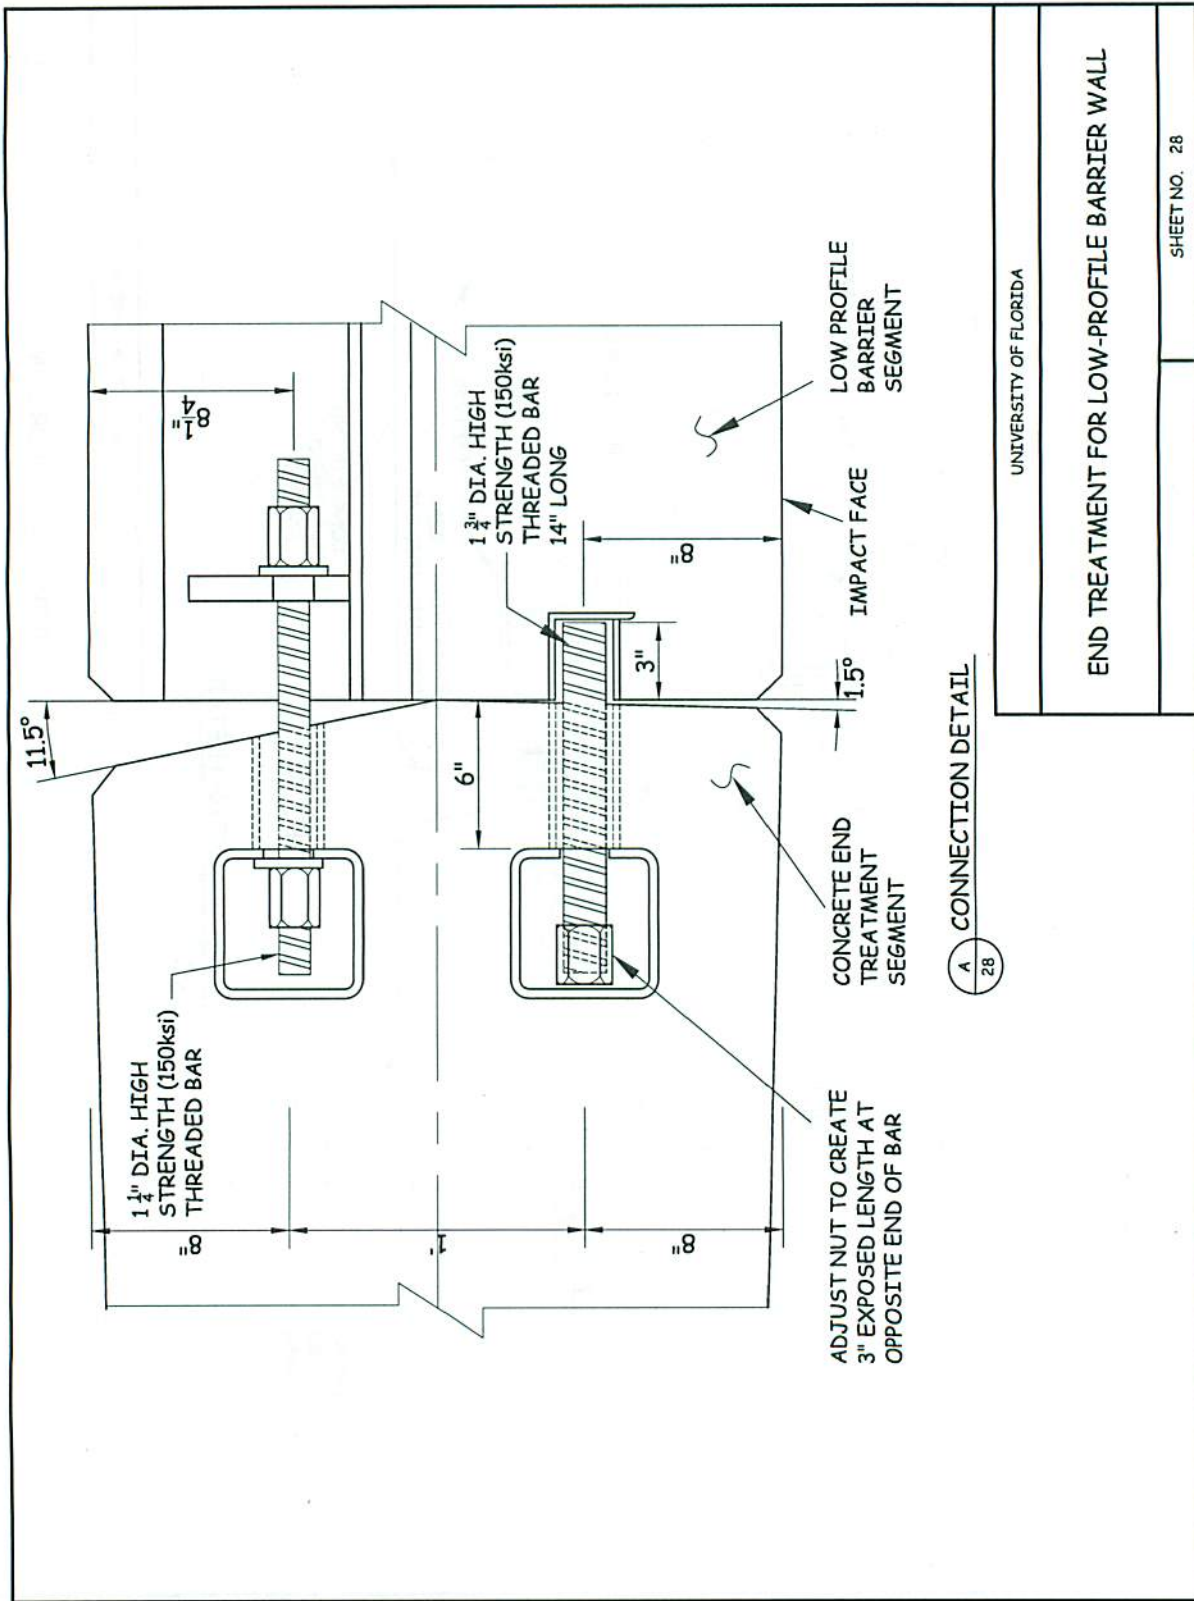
Drawings of Florida Concrete Curb End Treatment (12 of 14)
